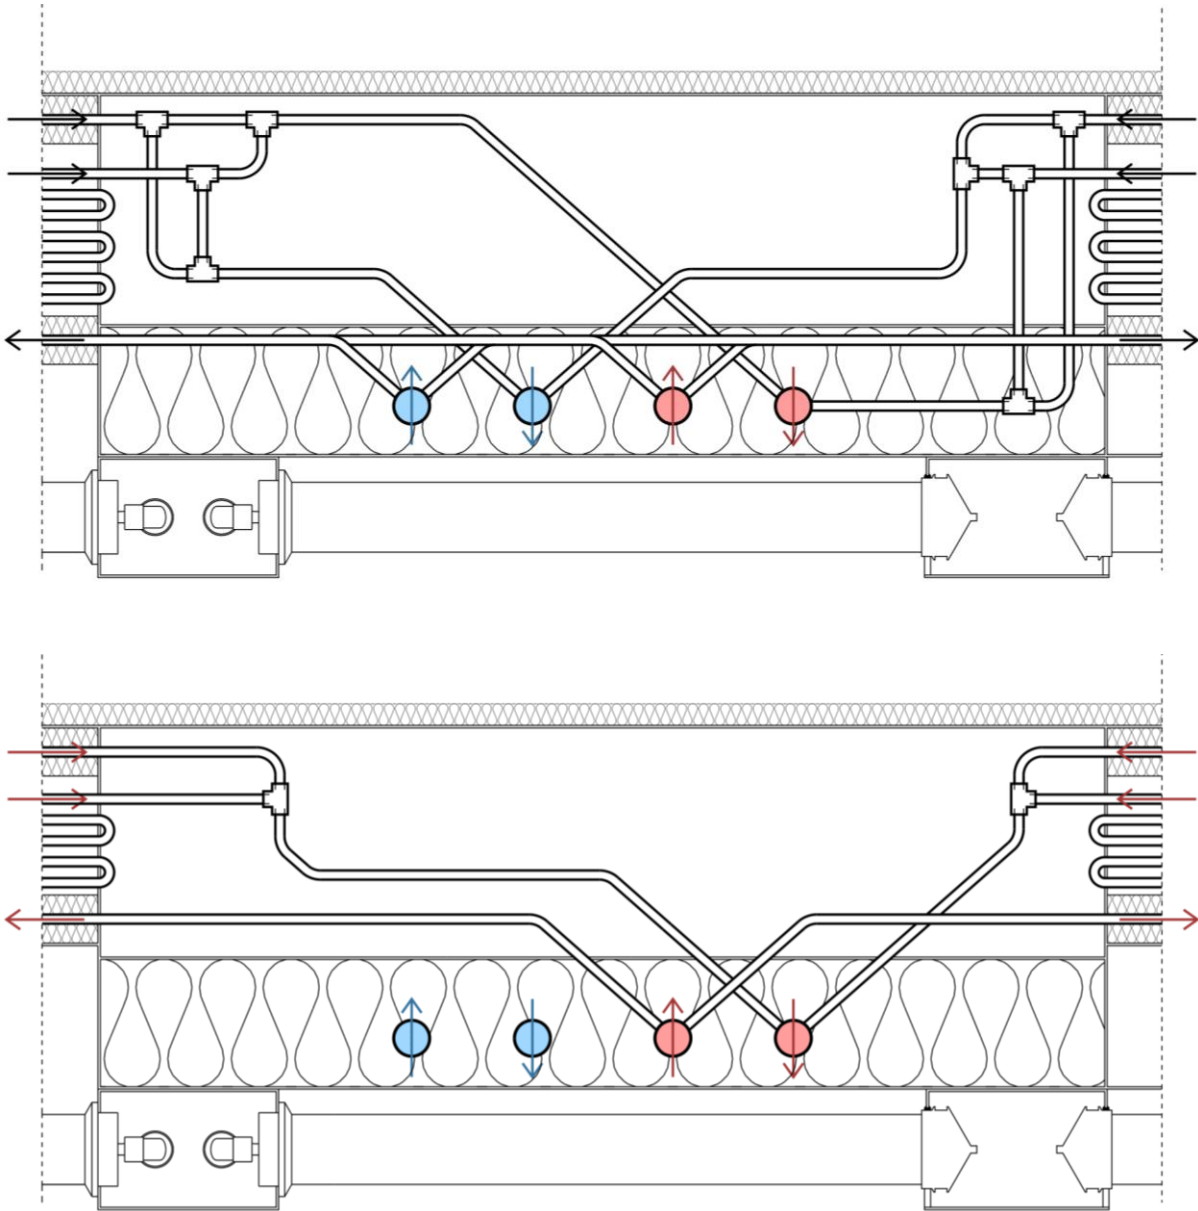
Horizontal section through vertical duct showing water piping network DCHes (Top) and HRD heat exchangers (Bottom).
